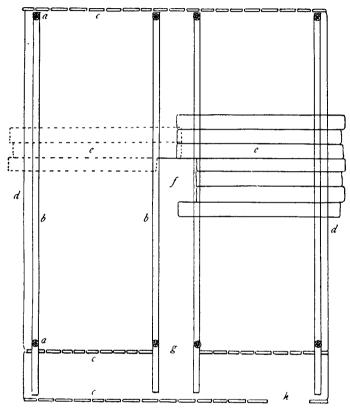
Plan of Shasta house. a, Posts; b, plate logs; c, vertical planks of end walls; d, low side walls of earth lined with bark; c, roof planks; f, fireplace and smoke hole; g, inner, h, outer door; wood room to left of doors. (After Dixon.)
